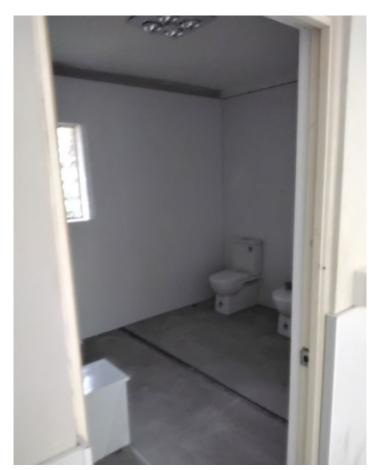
First floor bathroom, WCs and washing (wudu) area already installed.
